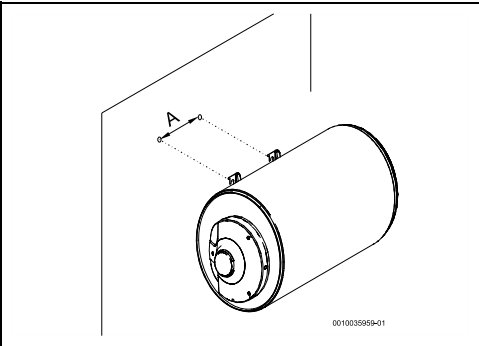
Horizontal installation (Wall mounting TR1000...H)
